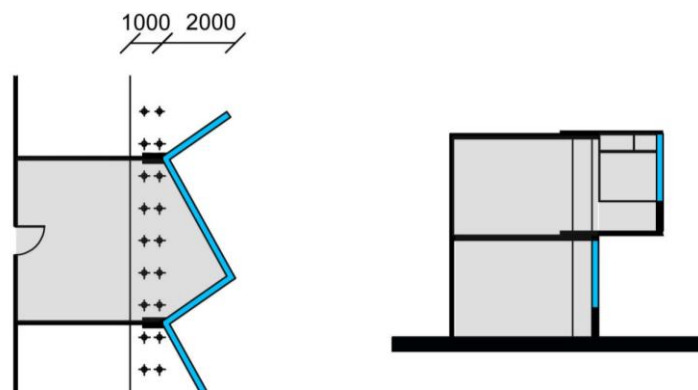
Diagrams that show the way a multi-angled façade unit is connected to a building façade according to scenario 2
